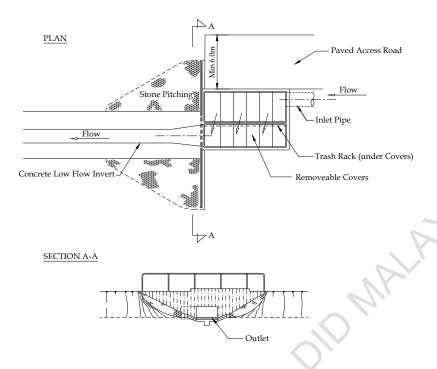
A Typical Minor SBTR Trap Arrangement
